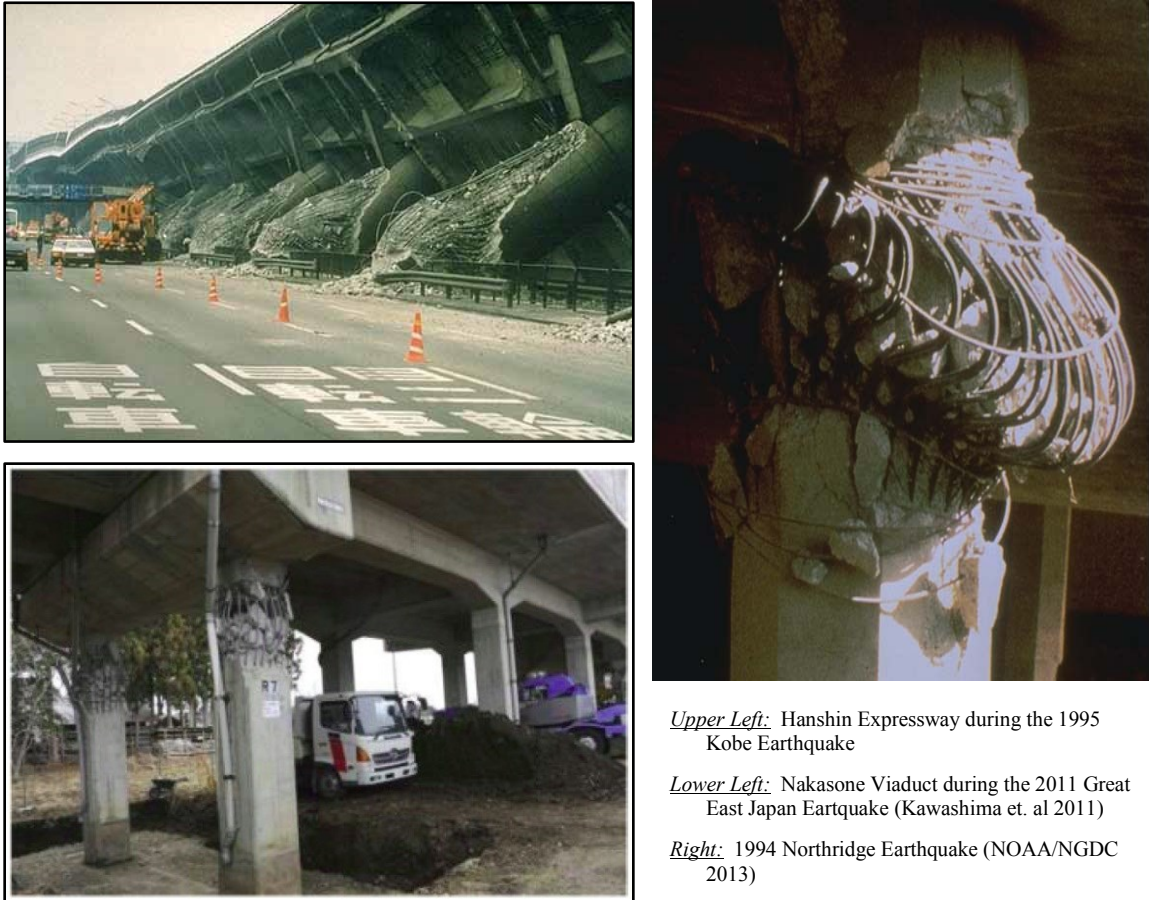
Confinement damage to reinforced concrete columns
